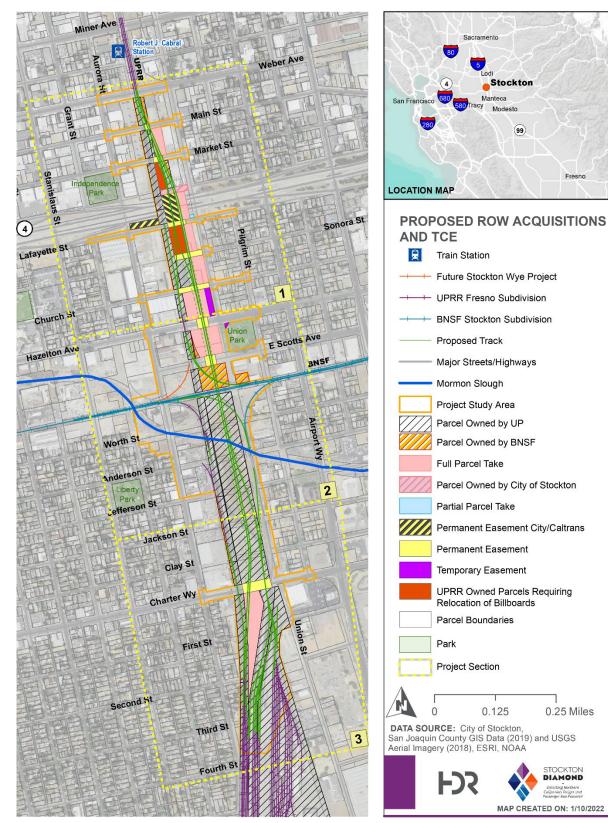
Proposed Right-of-Way Acquisitions and Temporary Construction Easements
